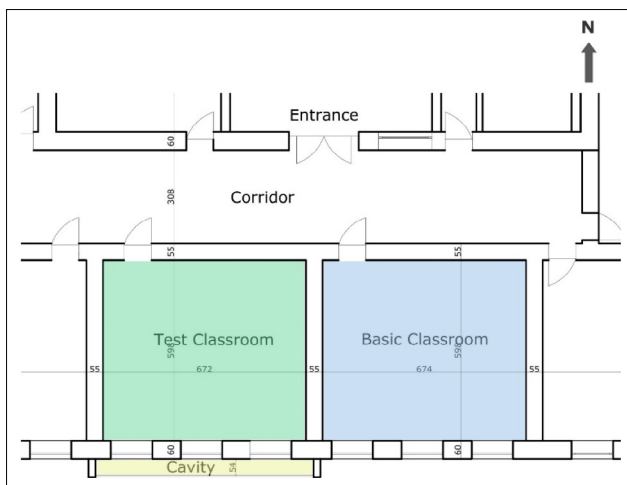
Plan of the test classroom in which glass façade is installed and basic classroom.
